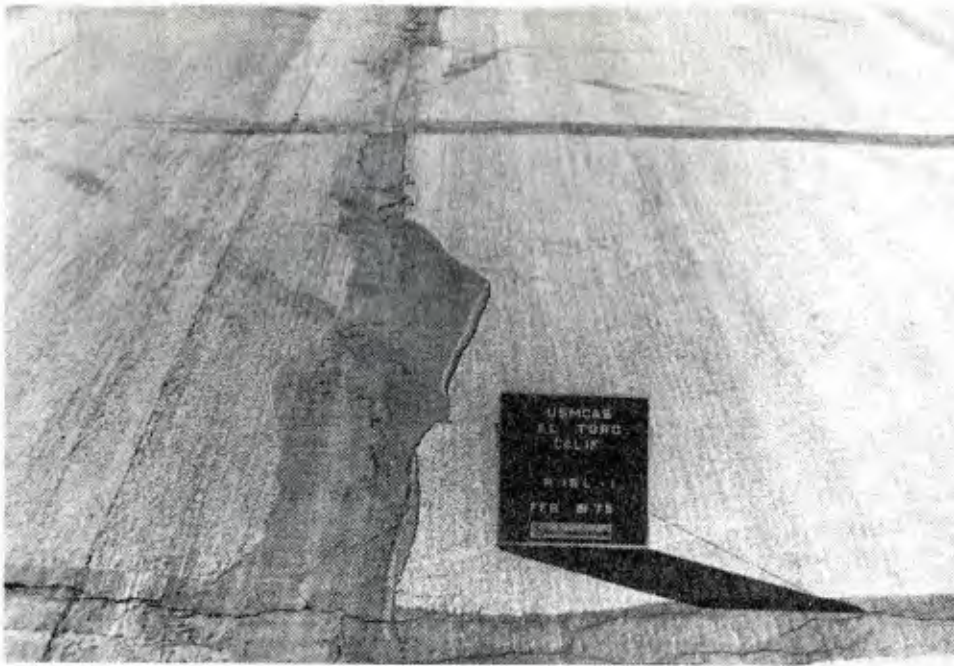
REFLECTION CRACKS, DISCRETE AREA R16L-1
